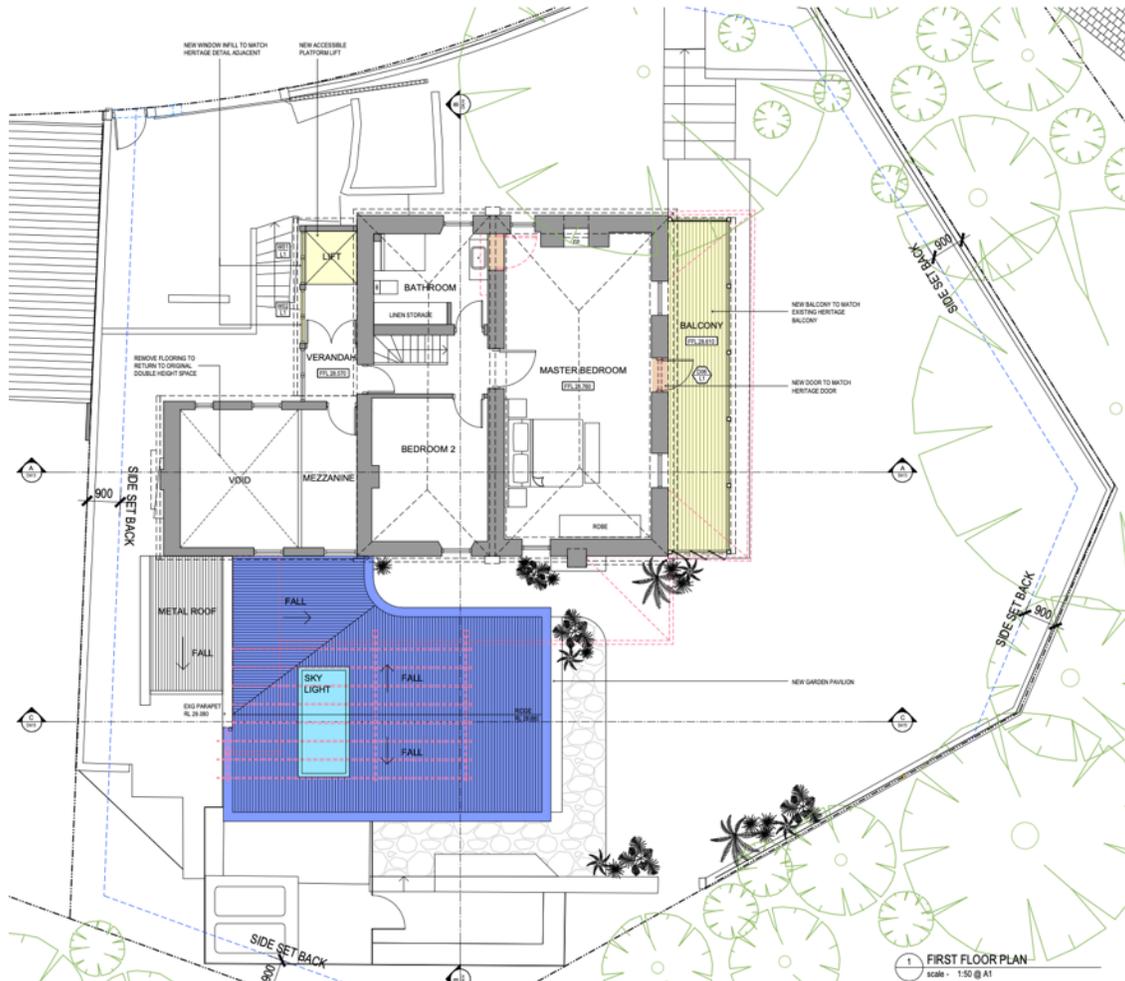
, Proposed First Floor Plan, Michael Cumming Architect, 24.02.23
